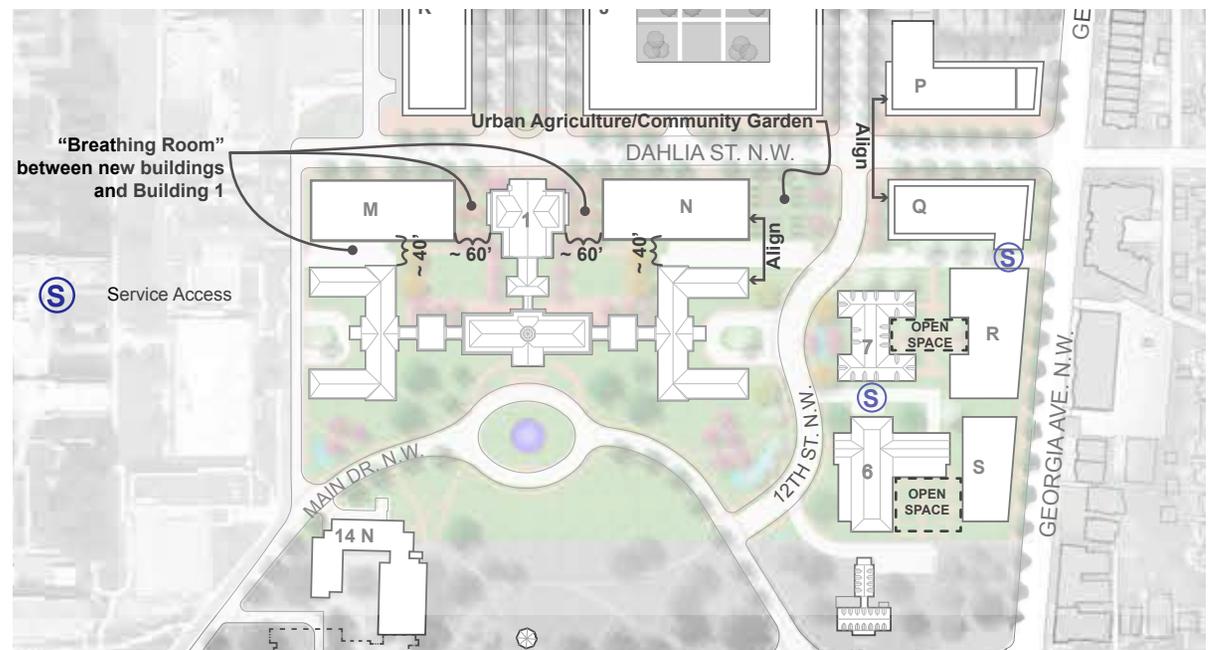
Sub-Area Plan 3. Source: Perkins+Will.
